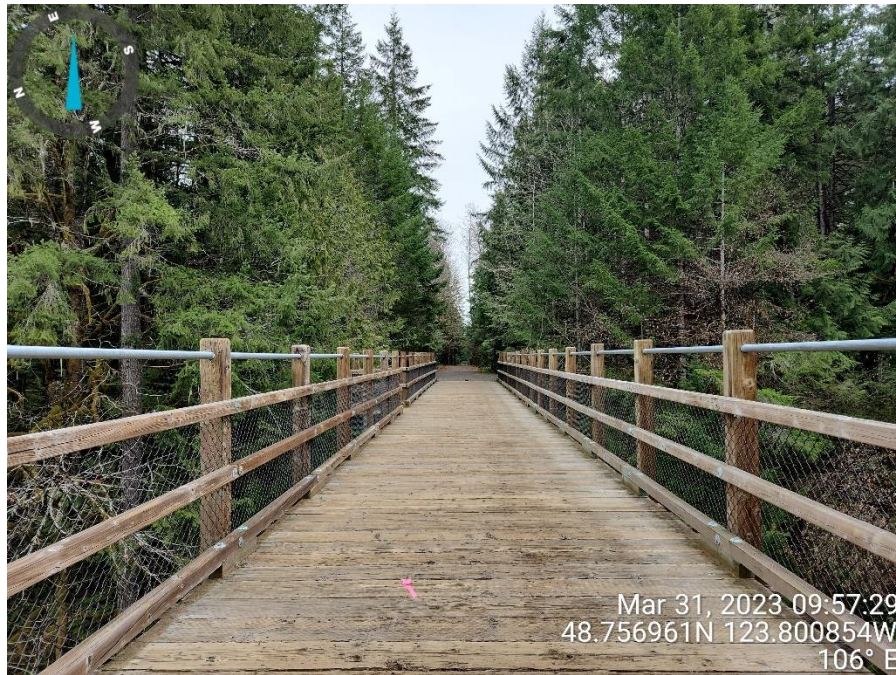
Bridge deck and handrails consists of untreated timber. Facing east.
